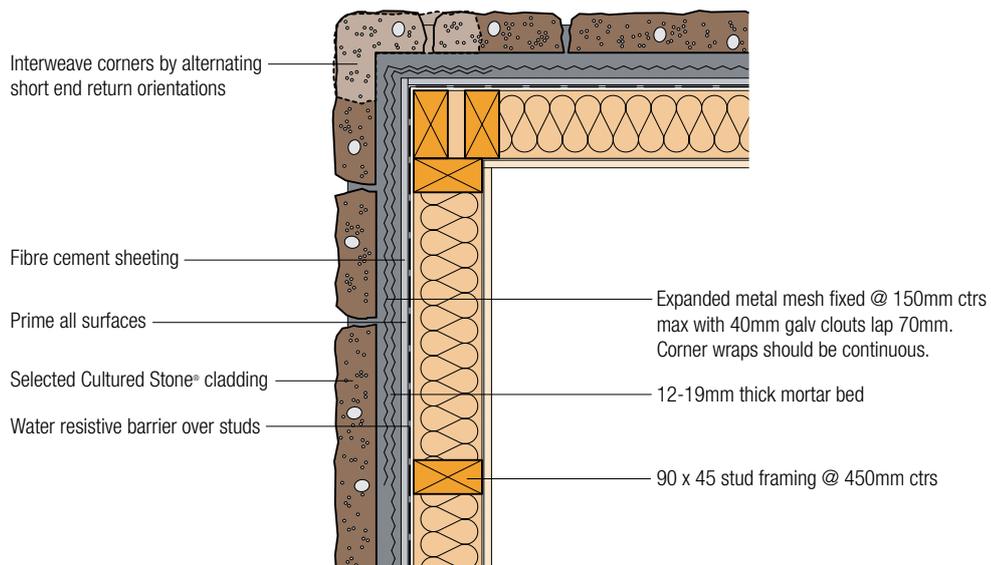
Fibre Cement Clad Typical External Corner - Plan (Dwg # CS-02.01)
